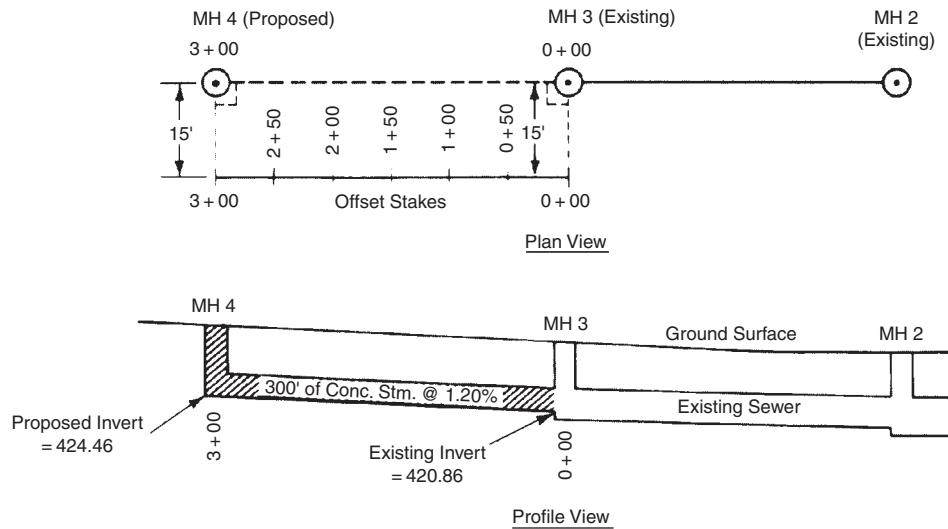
Plan and profile of proposed sewer (foot units).
